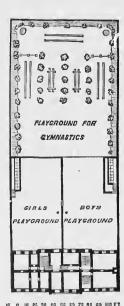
HLOCK PLAN OF SCHOOL-HOUSE AND PLAYGROUNDS.
